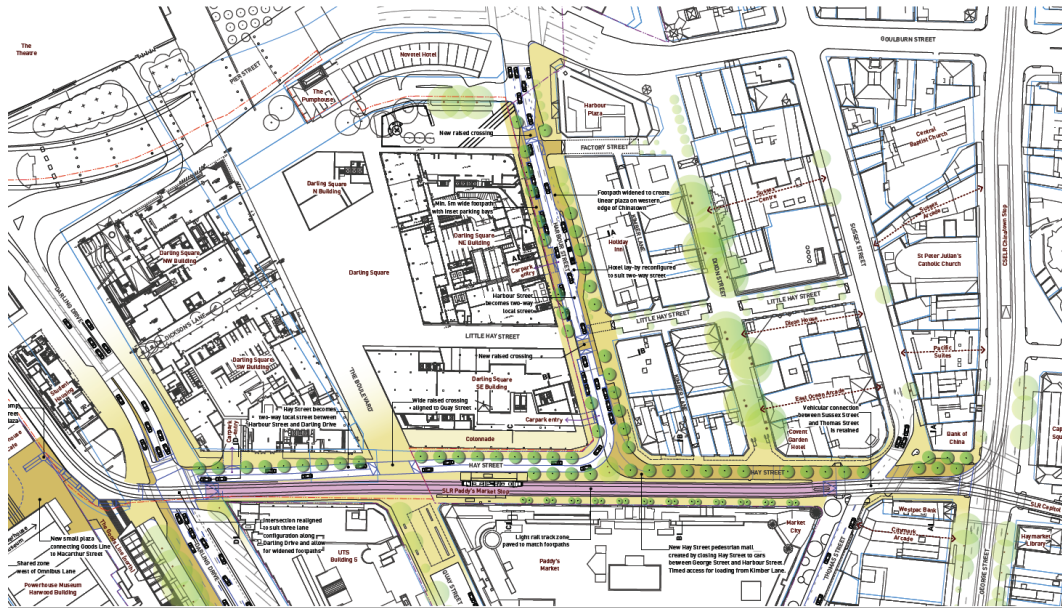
Proposed east-west connection between Darling Drive and Harbour Street
